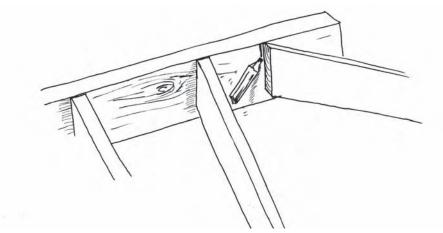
Marking the cut off position of the ridge for the installation of the last jack rafter
